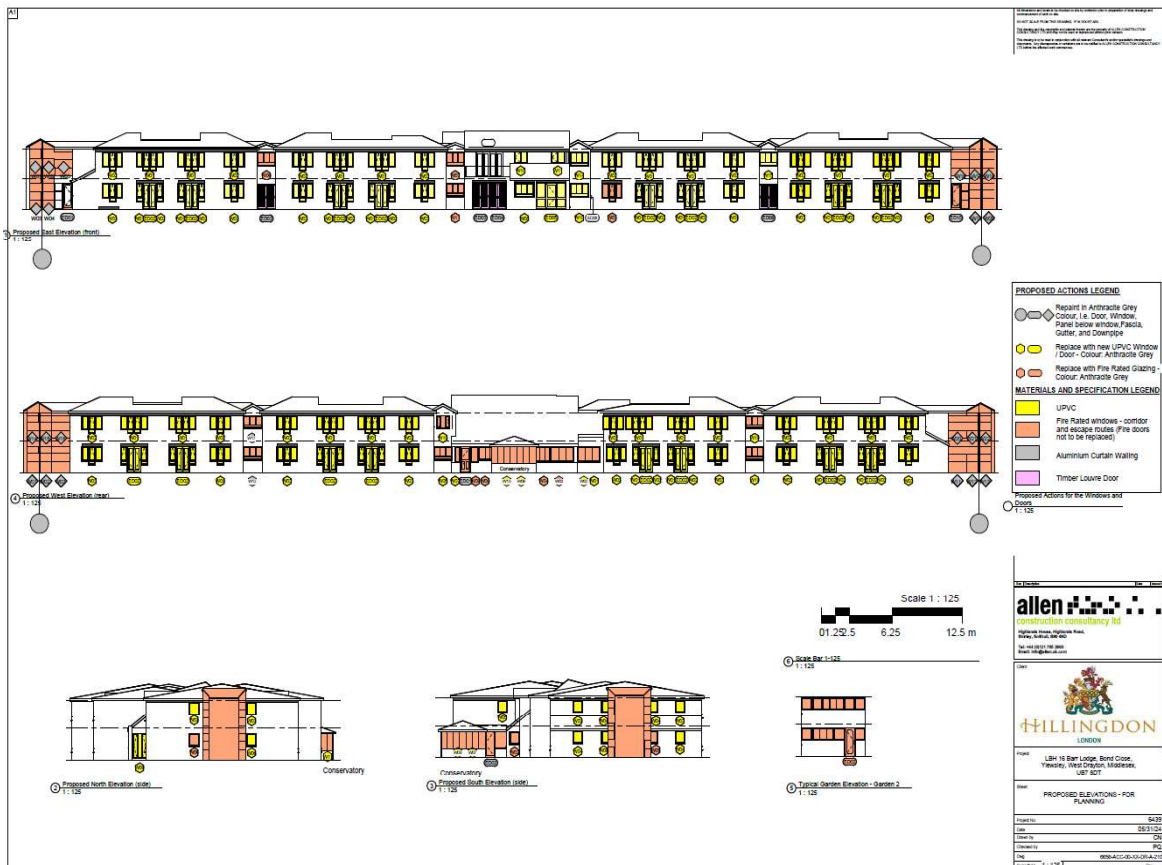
Proposed Elevations (please note – larger version of plan can be found in the Committee Plan Pack)
